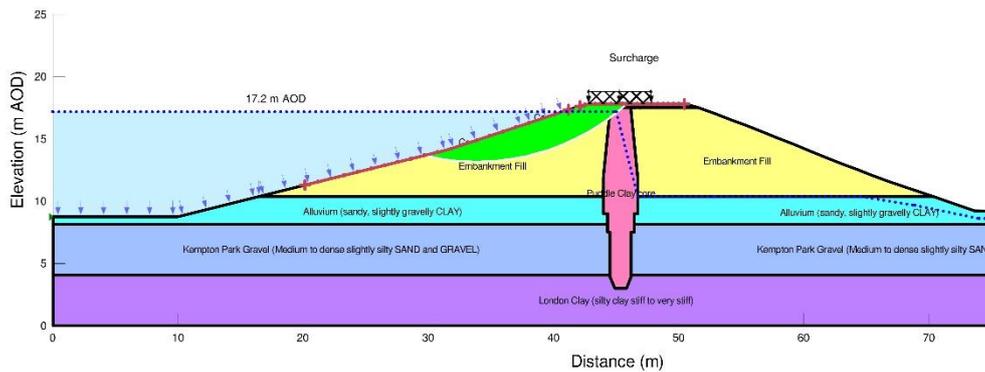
Dam Stability Analysis – Lowered section with working surcharge
